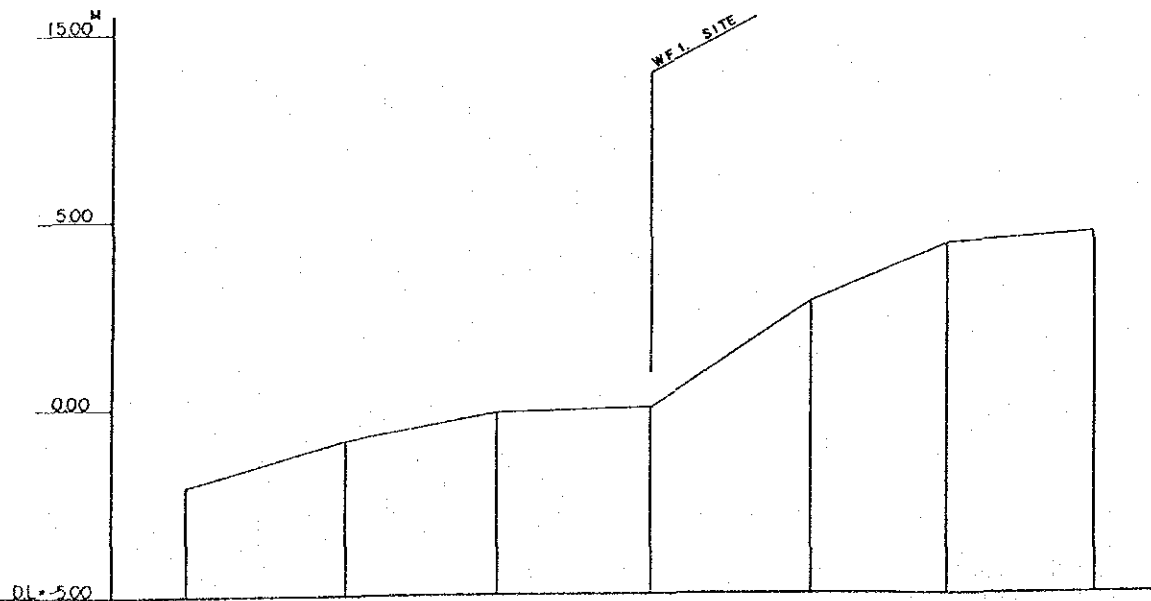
(5) Cross-section and Longitudinal Profile of Wadi Gauge Site, WF1
